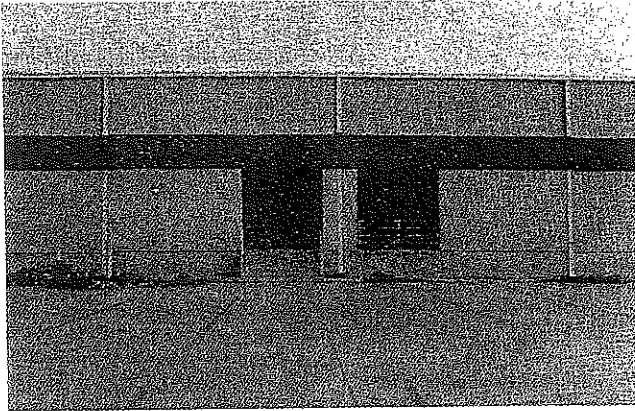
Tilt wall movement associated with severe floor movement. Note accent stripe. Movement at pier connection shown in Fig. 13.
